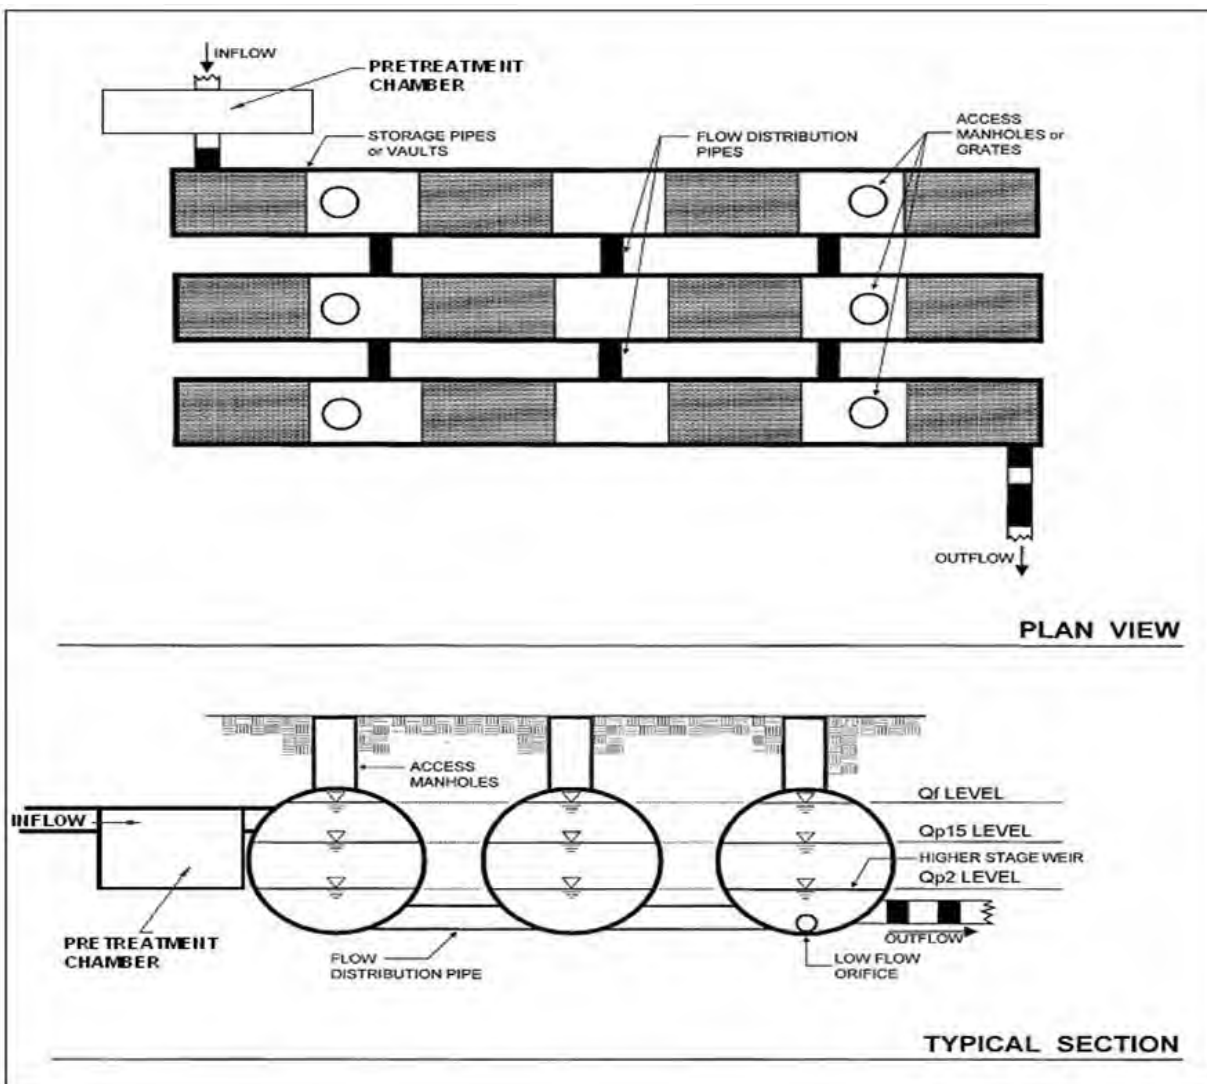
Example of an underground detention vault and/or tank (S-1).
